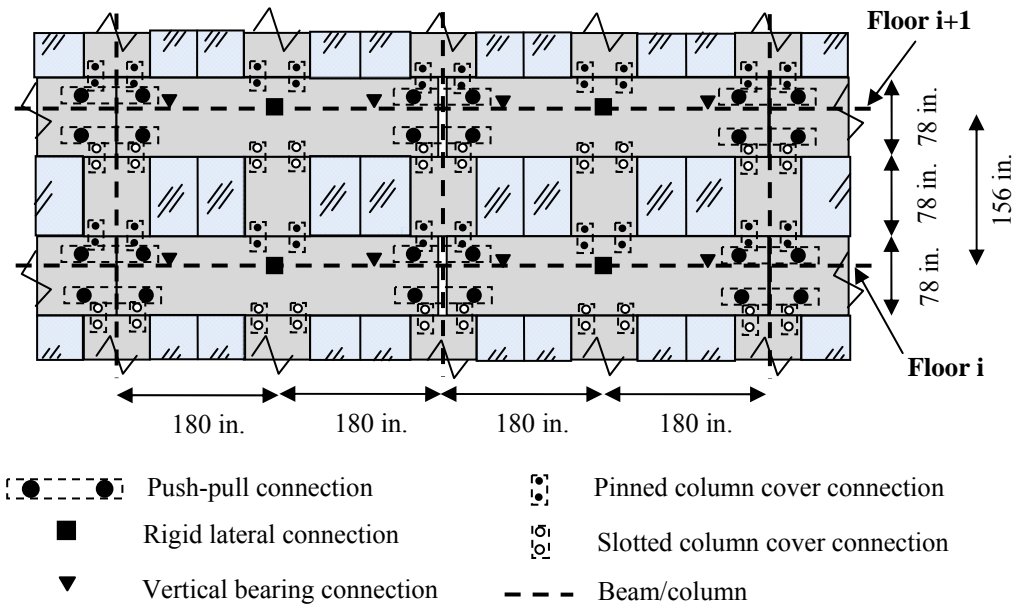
Detailed elevation of cladding system C3 and window panes
